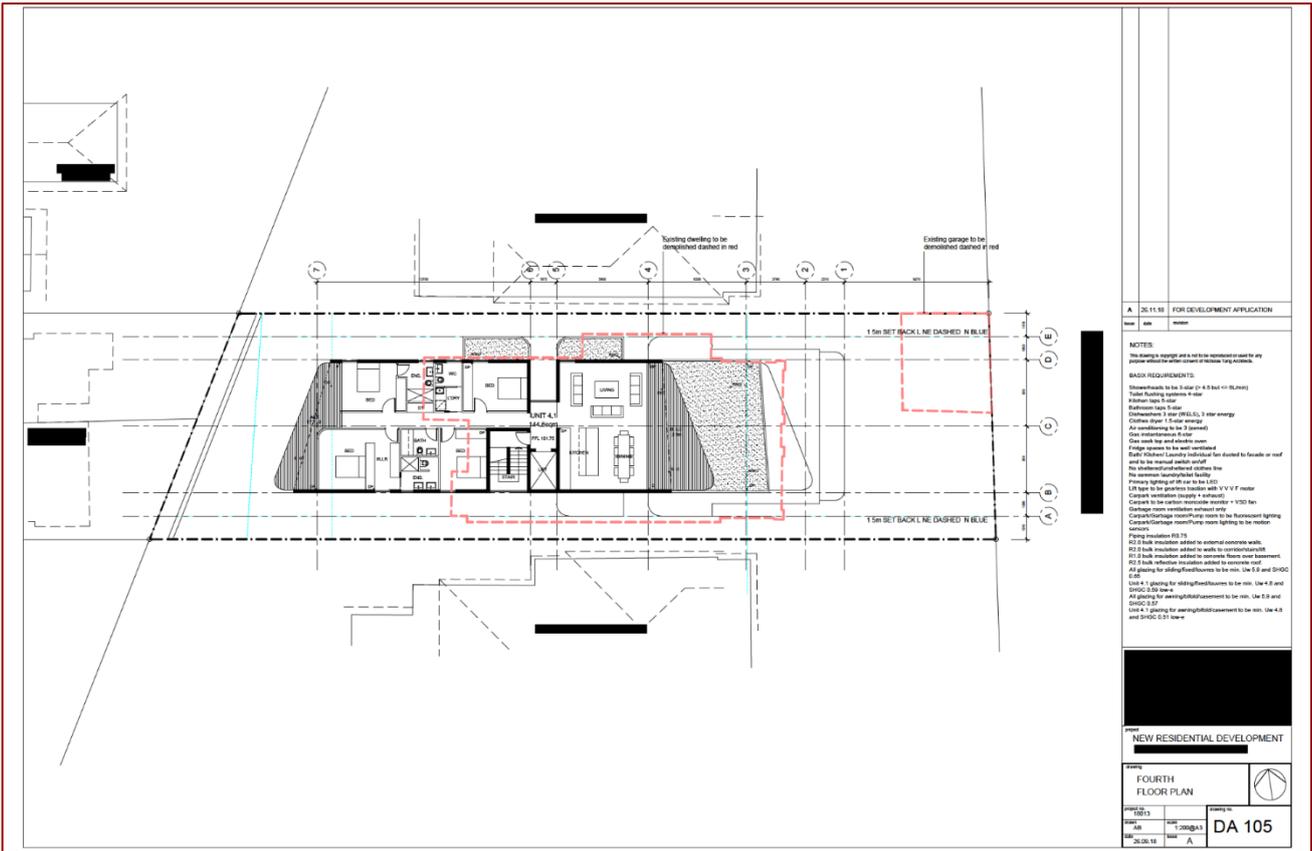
BASIX Mid-rise sample building fourth floor plan
